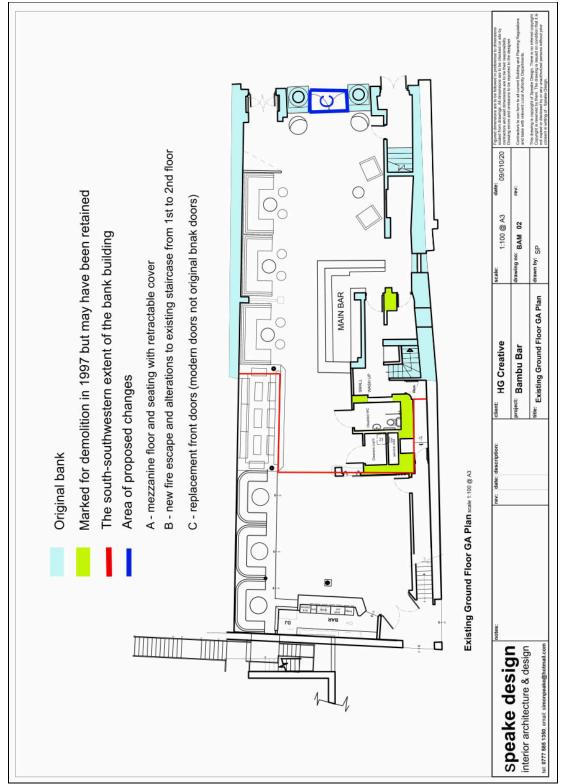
; A plan of the ground floor showing original and modern fabric. The modern door which will be improved in marked C. Its improvement would not impact on the historic fabric of the building.
